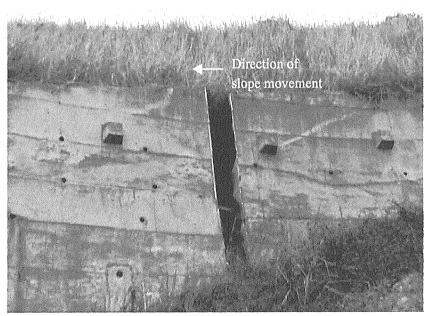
Opening at construction joint of anchored RC retaining wall due to large-scale slope movement (at an embankment along District Road No. 129; site 2 in Fig. 1)
